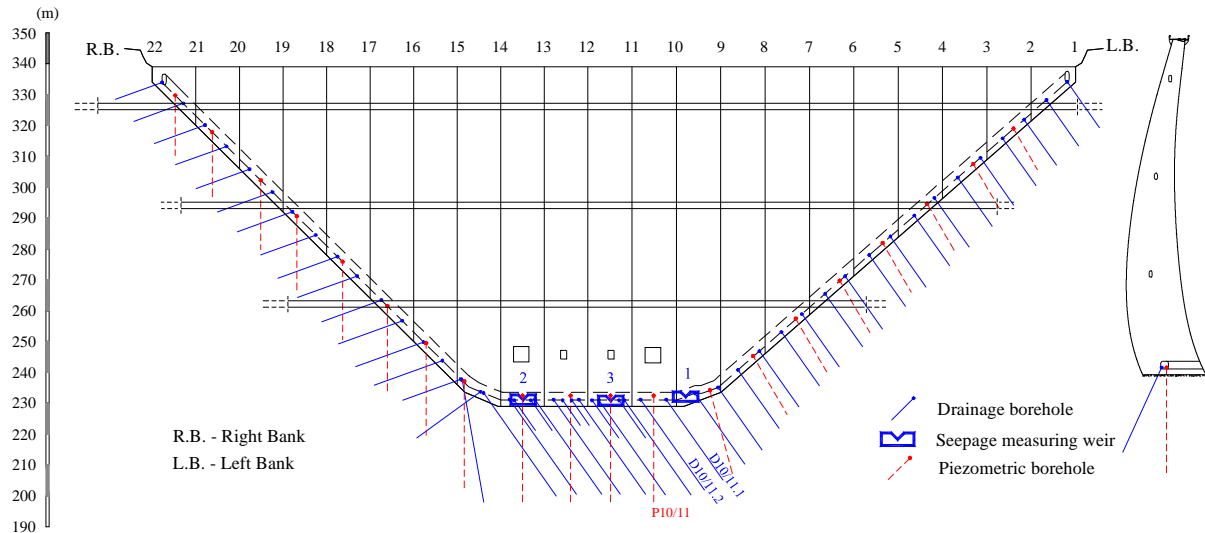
Drainage and piezometric systems in the foundation of Alto Lindoso dam
